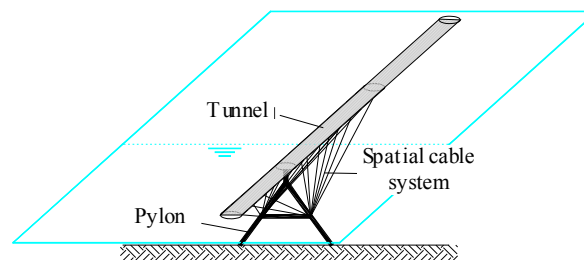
Sketch of possible pylon configuration for spatial cable system in a Cable Supported Immersed Inverted Bridge.
